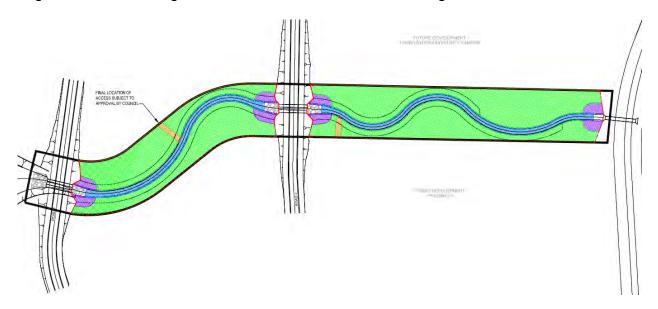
East West Fauna Corridor within Precinct 6, indicating proposed location of the culvert crossings (far left and centre), low flow drain (blue) and area to be vegetated (green)
